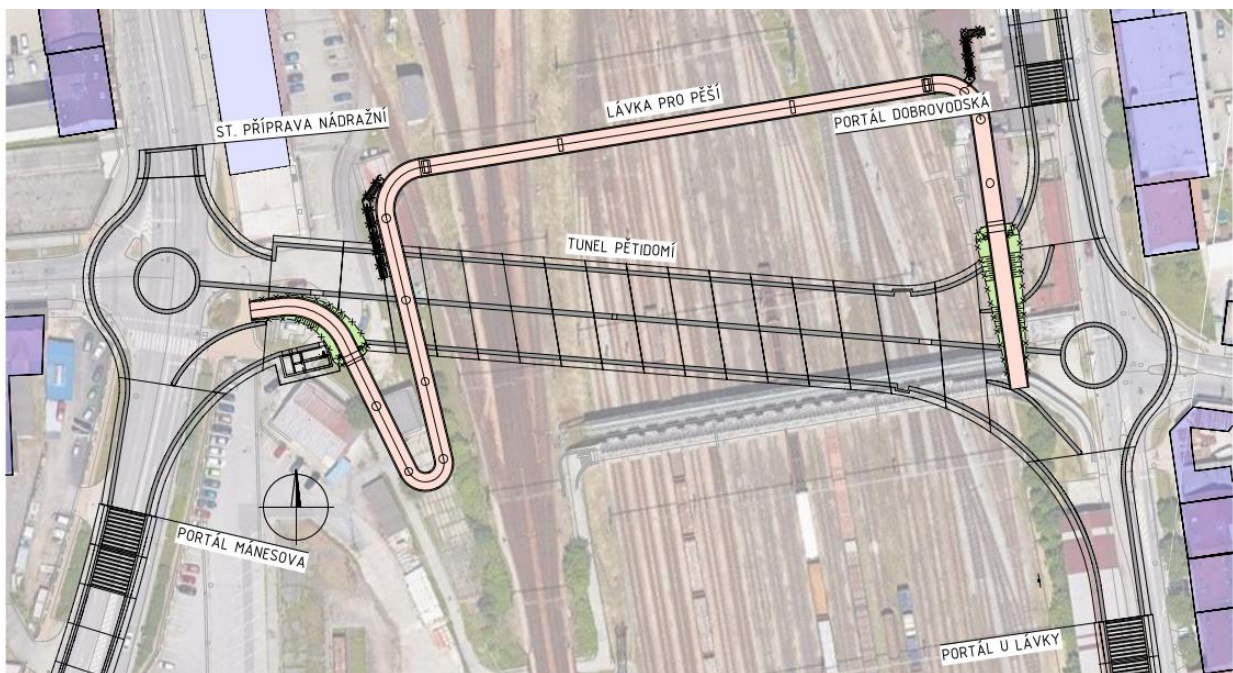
Structural diagram of the Pětídomí tunnel with underground crossings
